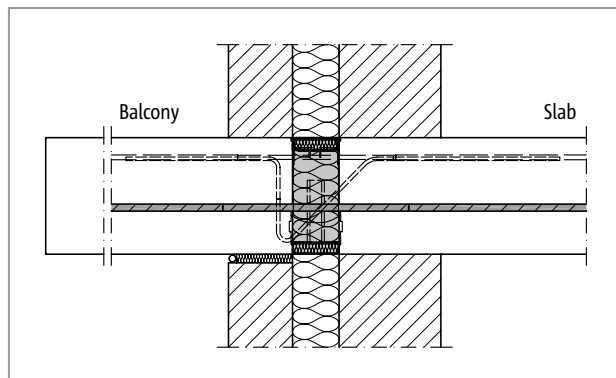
Schöck Isokorb® T type K, H-NN: Connection with non-cavity masonry
